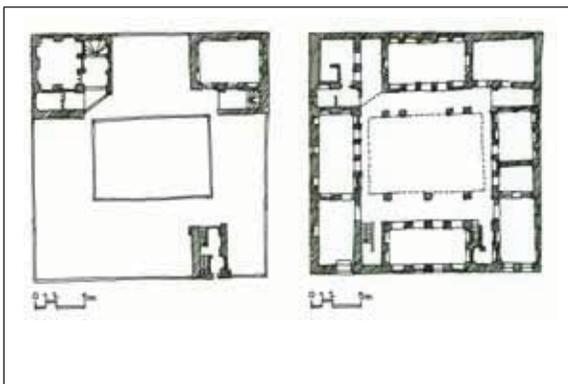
Plan of the ground and first floors of Tabib's house in Bandar-i Bushihr. Adapted from Ghazban-pur 1375, 30.
